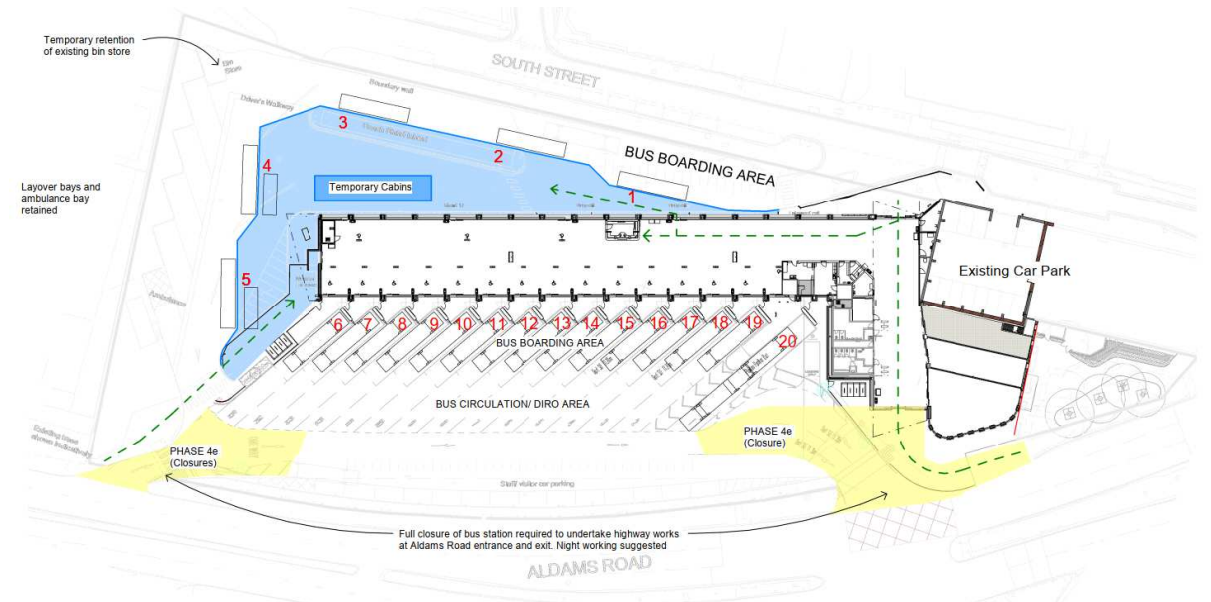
Phase 4e Plan – Southern Access Re-surfacing
